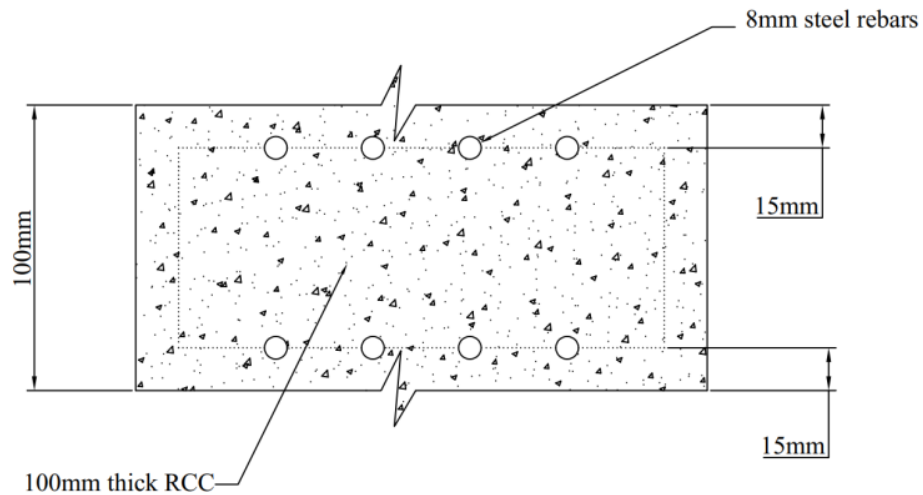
Cross-sectional view of the slab showing the layout of the steel reinforcements.
